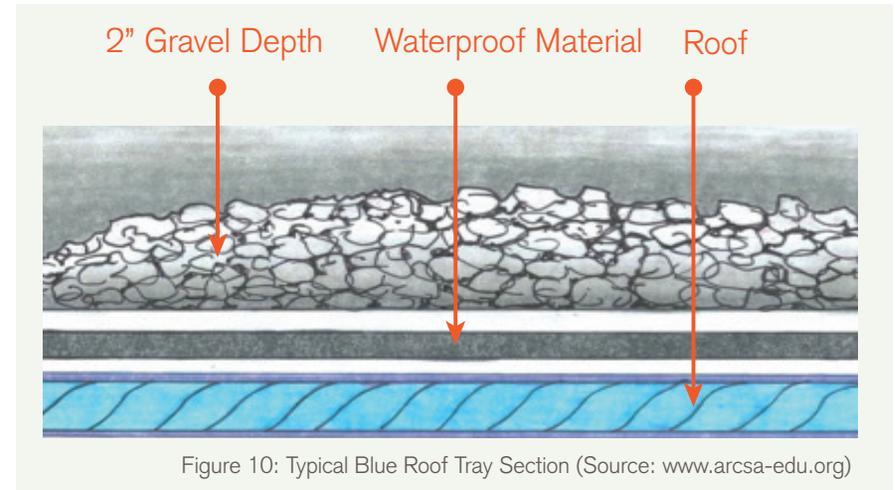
Typical Blue Roof Tray Section (Source: www.arcsa-edu.org)
